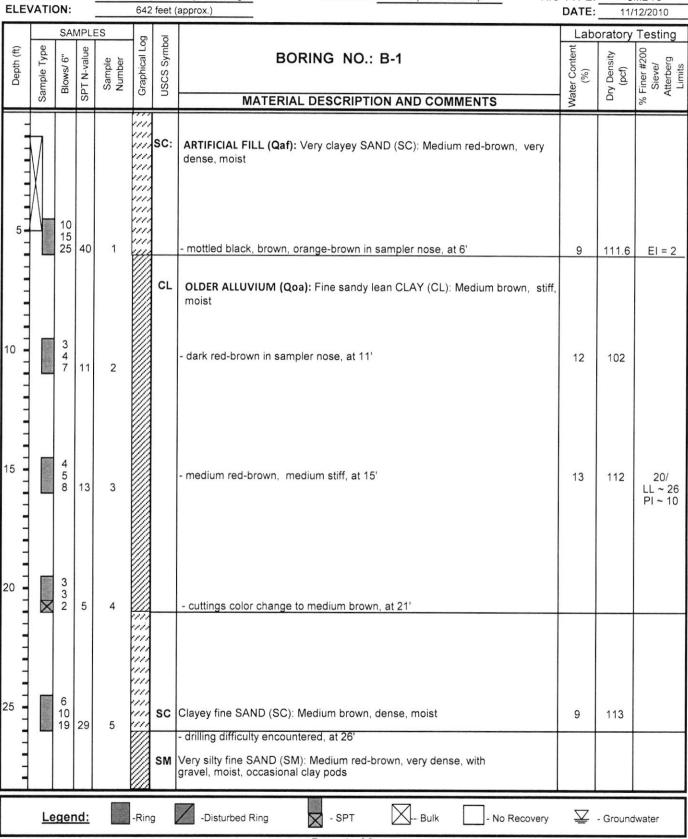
2.4 - Logs of Borings B-1 and B-2 from Parking Structure Study<sup>3</sup>
